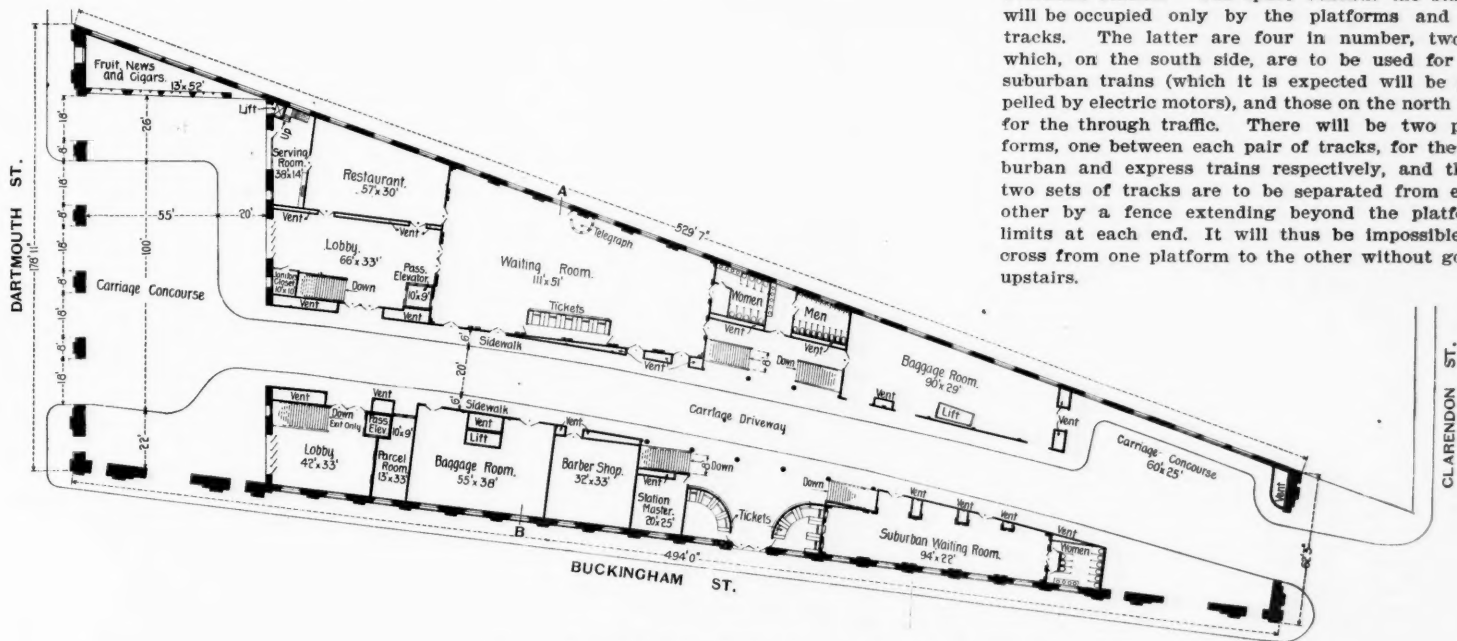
Plan of Back Bay Station, Boston—Street Level.
